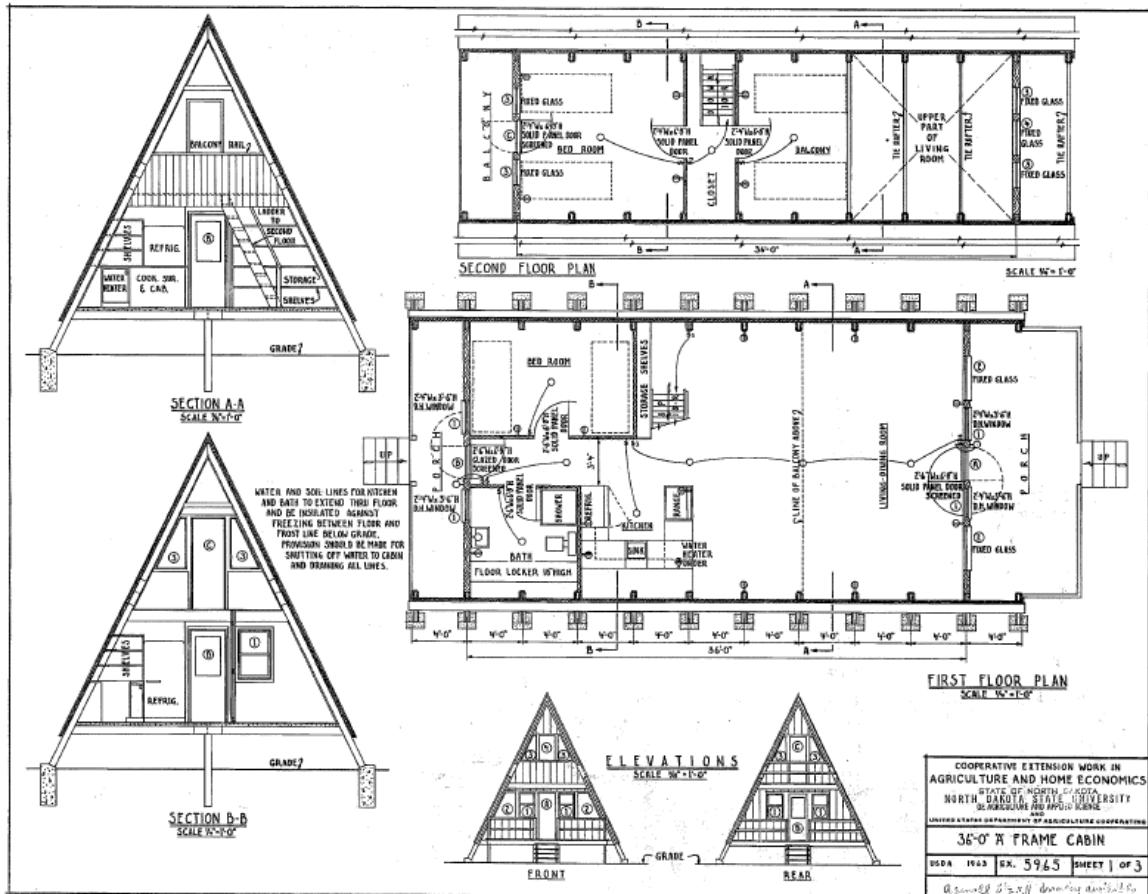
U.S. Department of Agriculture (USDA) A-frame cabin plans distributed through the North Dakota Extension Service, 1963.<sup>51</sup>
